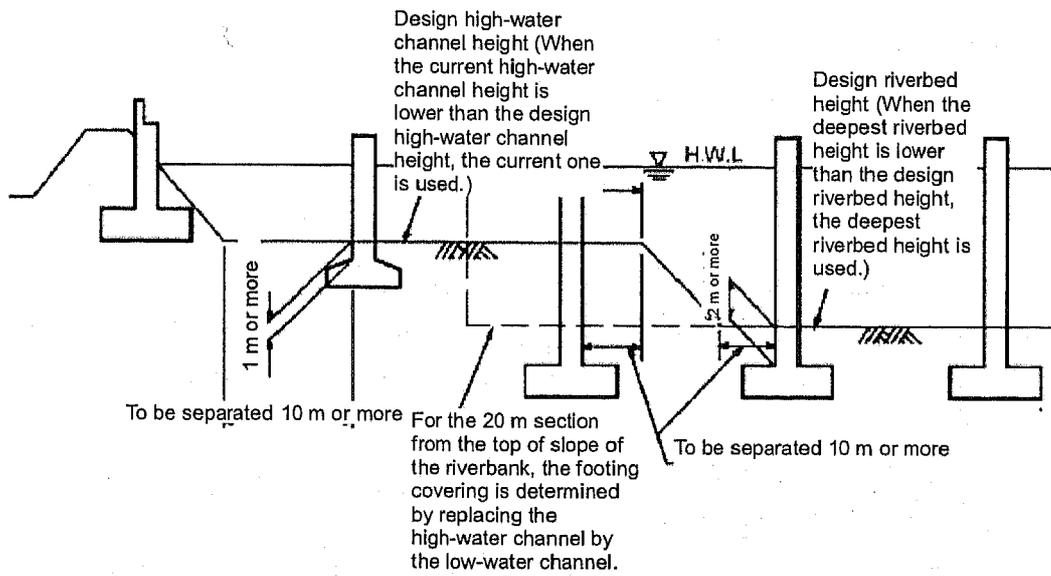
Conceptual drawing of the restrictions on the position of a pier and on the depth of embedment of a pier foundation
